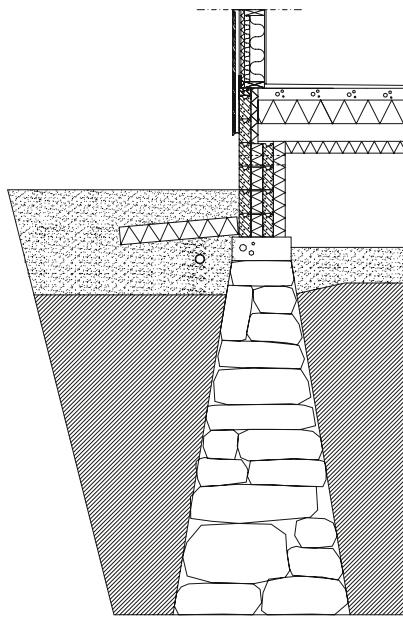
EXAMPLE OF A FOUNDATION RESTING ON THE GROUND.
